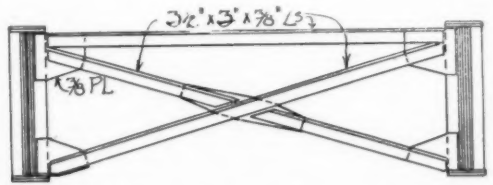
Detail of bracing between the ends of the parallel girders A and girders B at top of lantern.
